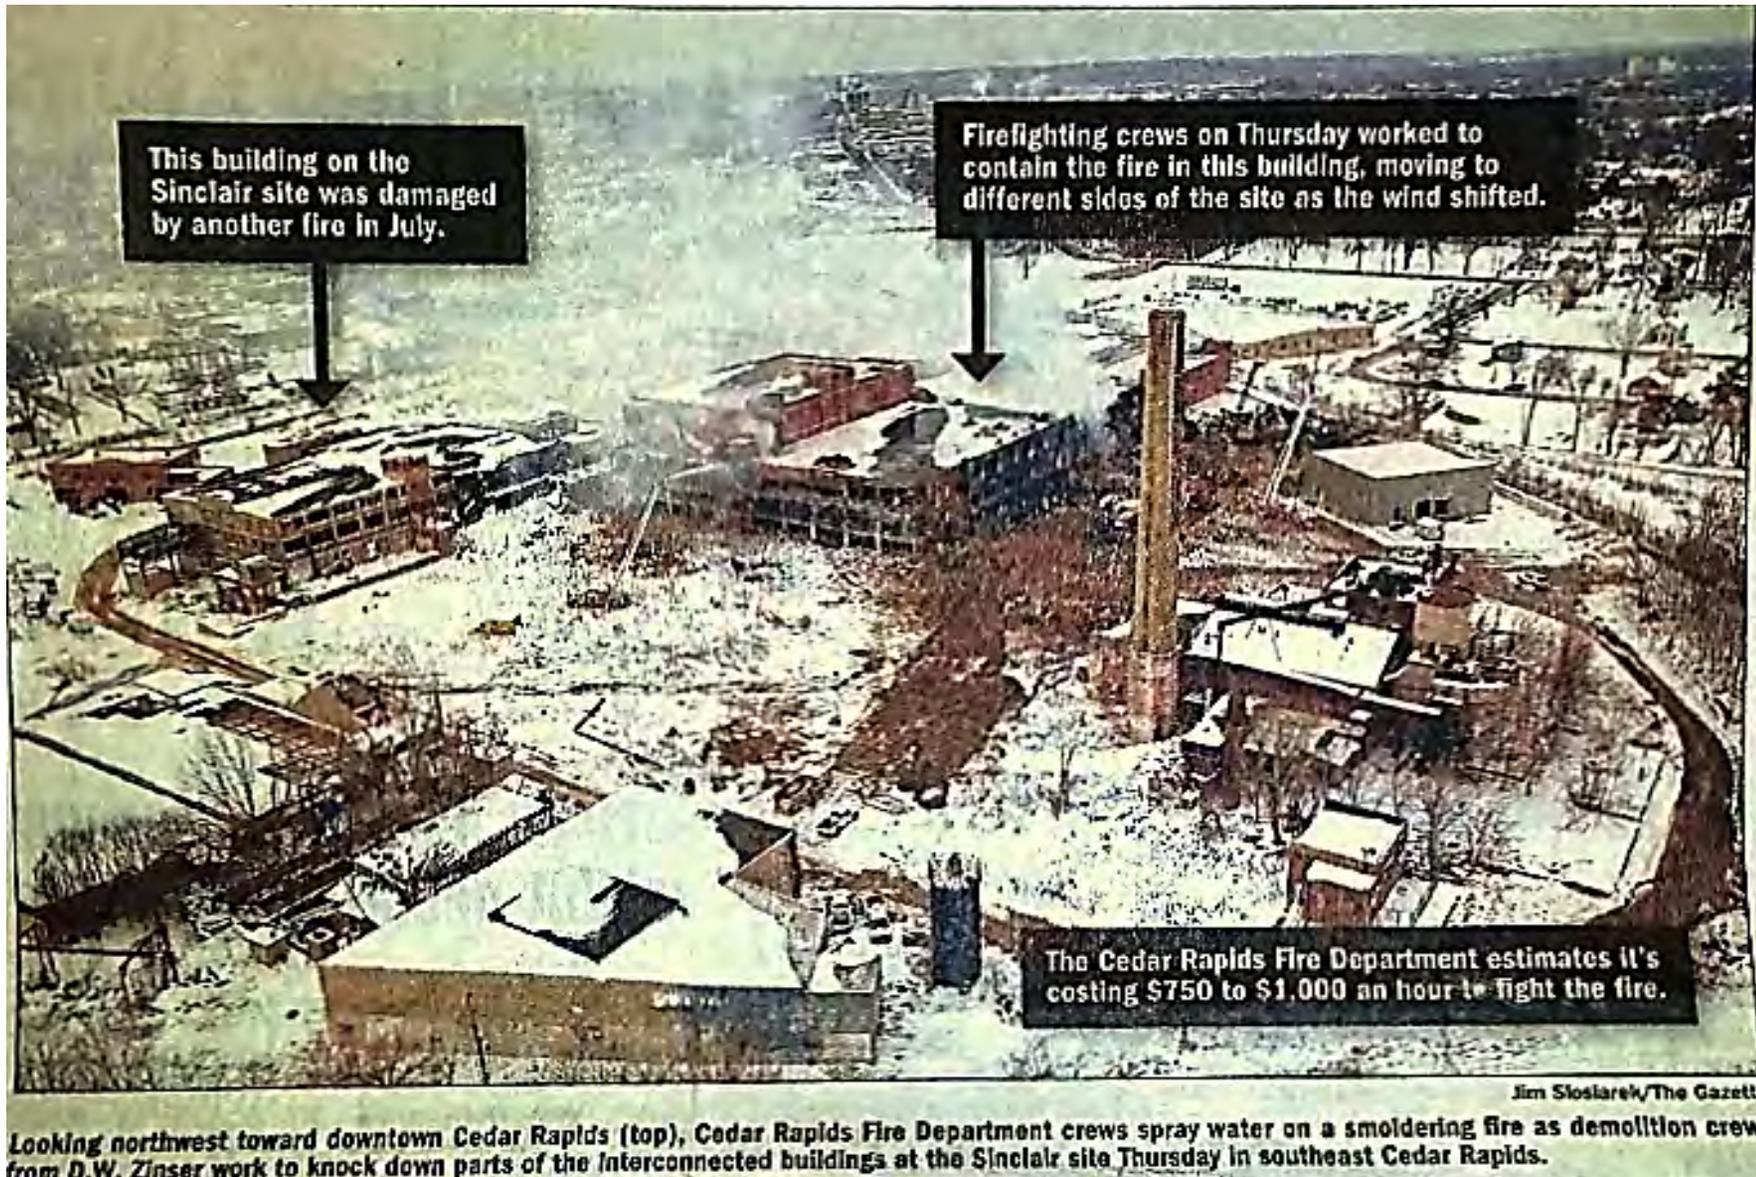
Aerial view of plant remains after December 2009 fire. From "Last Gasp: Fire Could Fast-Track Demolition of Sinclair Plant," Cedar Rapids Gazette, December 18, 2009.
